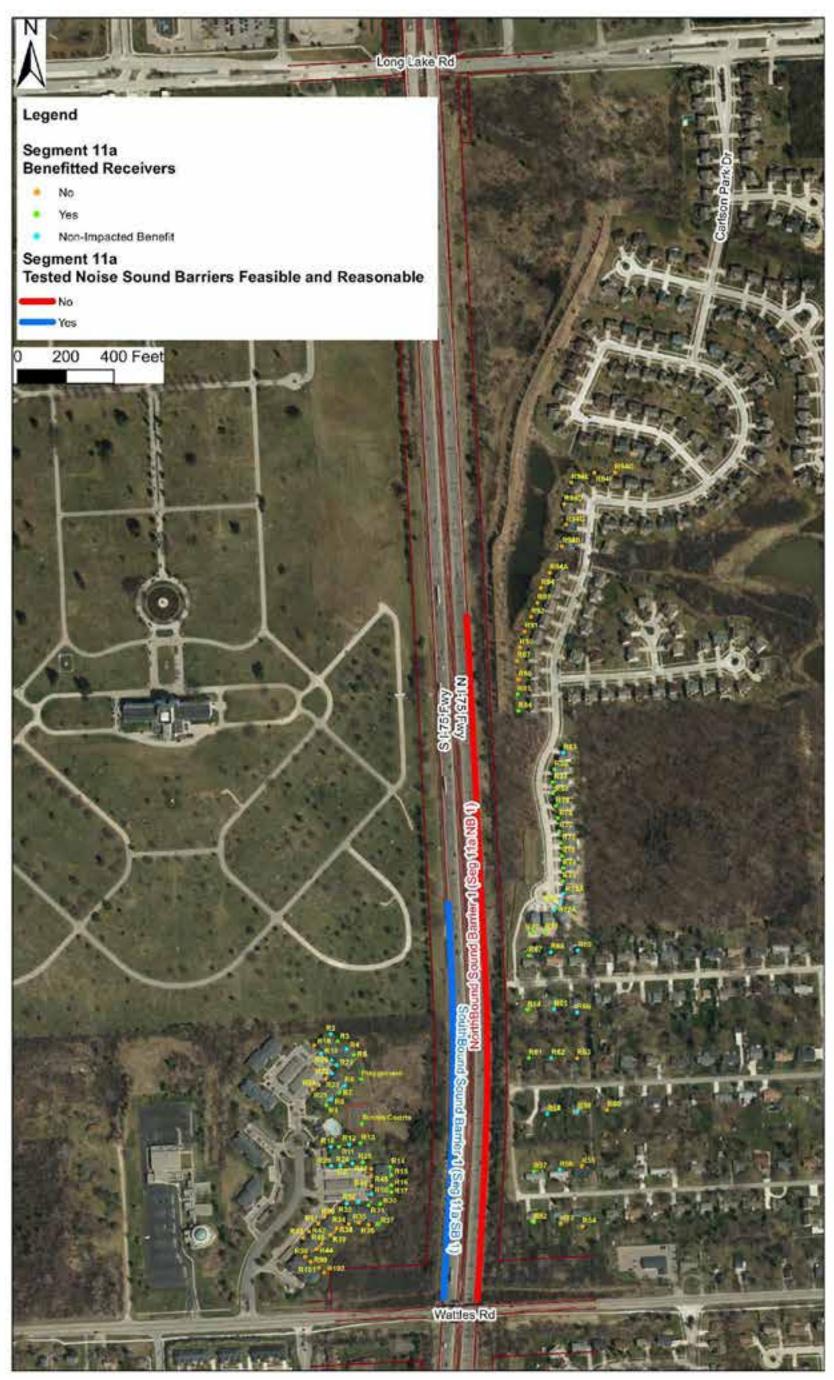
Segment 11 Sound Barrier Design Configuration for Benefitting Receivers Behind Southbound Barriers SB1 & SB2
